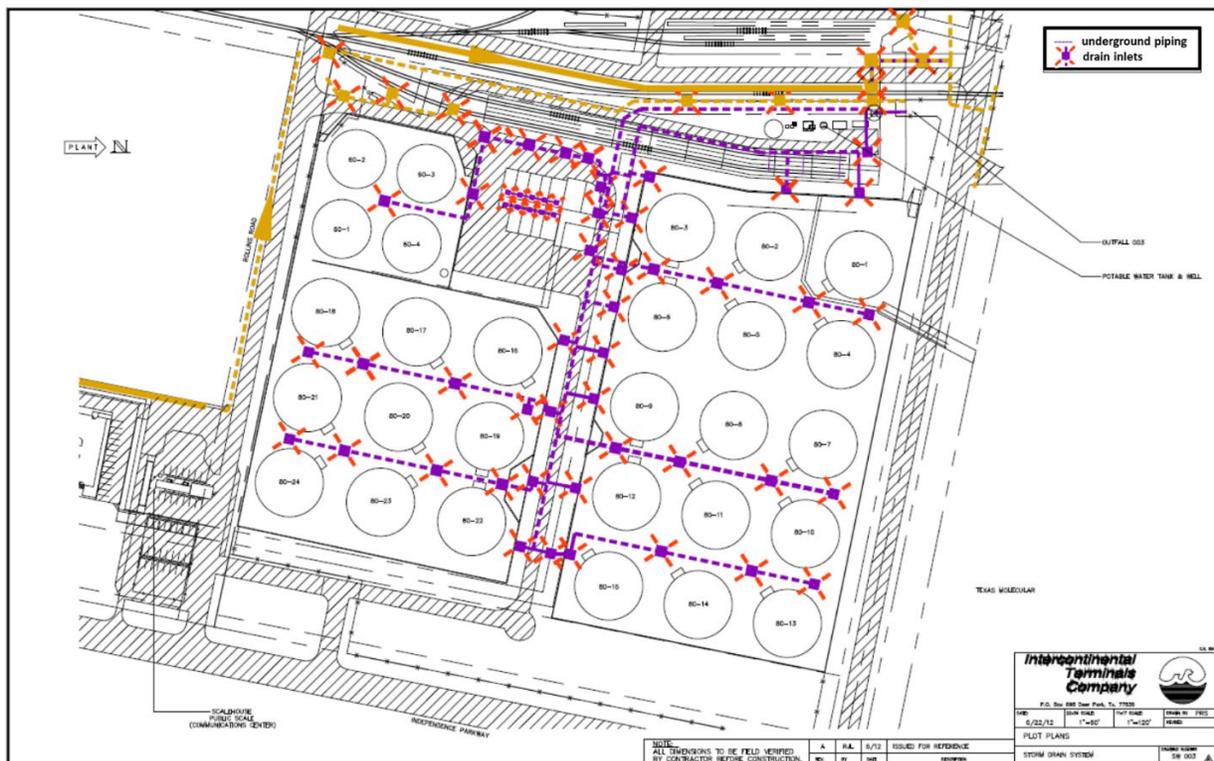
Plot plan of First & Second 80's tank farm stormwater drain system. (Credit: ITC)
